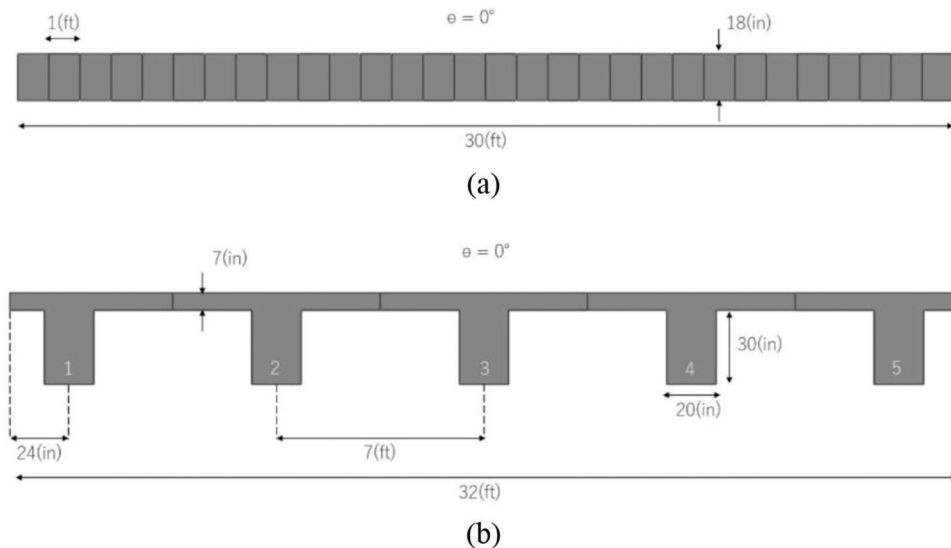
Reference models cross-section: (a) slab and (b) T-beam.
